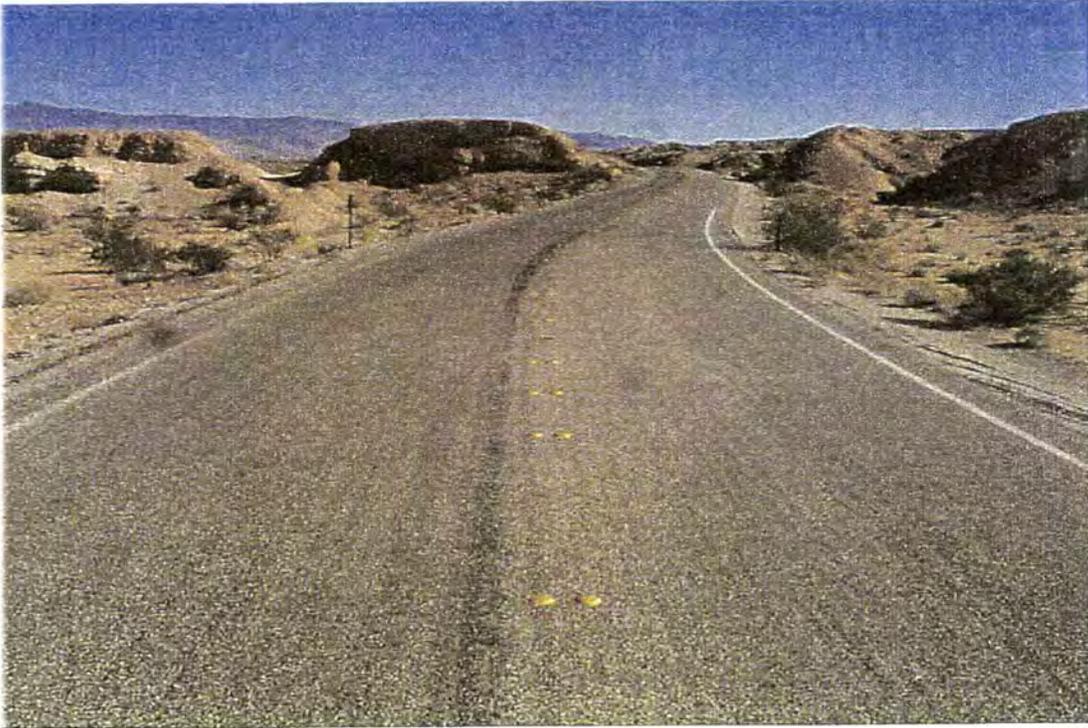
MP 0.00 - Begin at Rte 001, Typical Pavement Section
